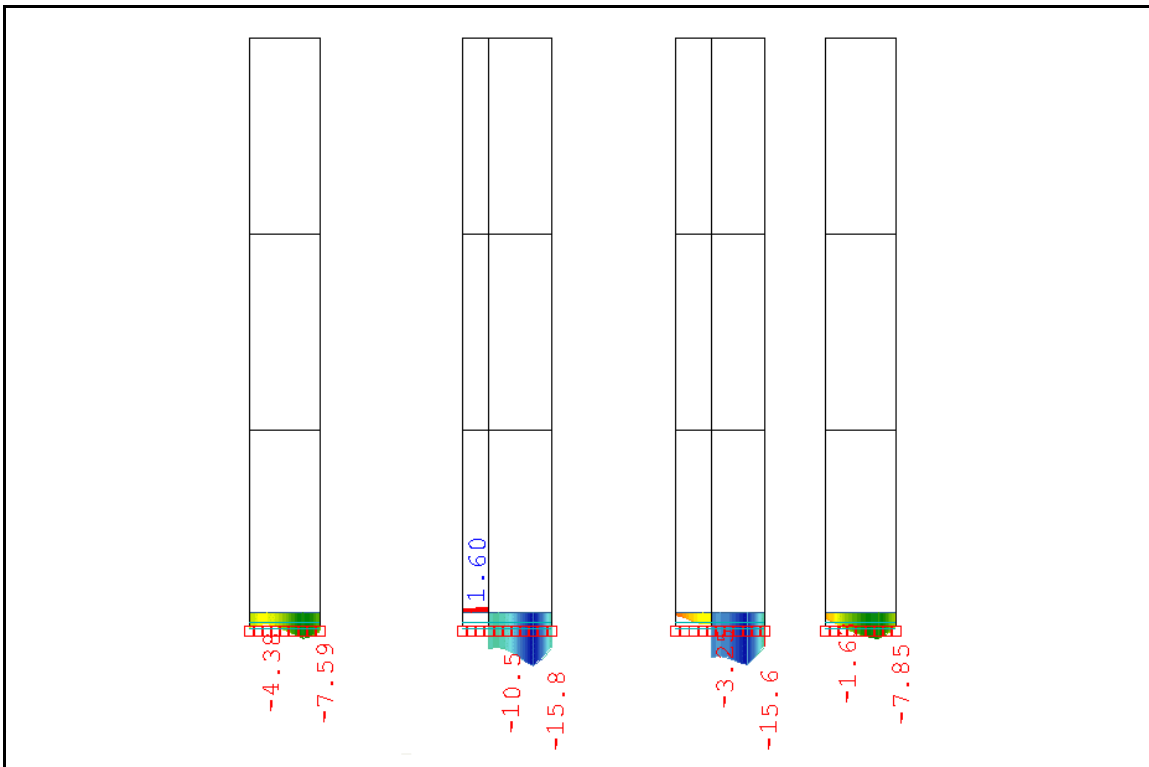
Apartment-House 1: Membrane forces [kN/m] perpendicular to the section – walls 1 to 4
